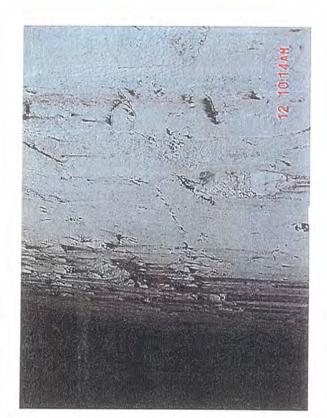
Wall Wet Well LagunaBeachLiftStationWall4.jpg 12/12/2002 (Thu), 1:31 PM
